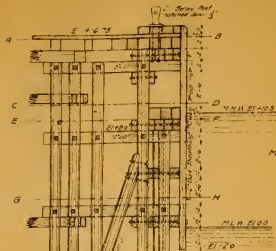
shows the elevation of a typical bent in the foundation and general dimensions and arrangement of timbers in same.
